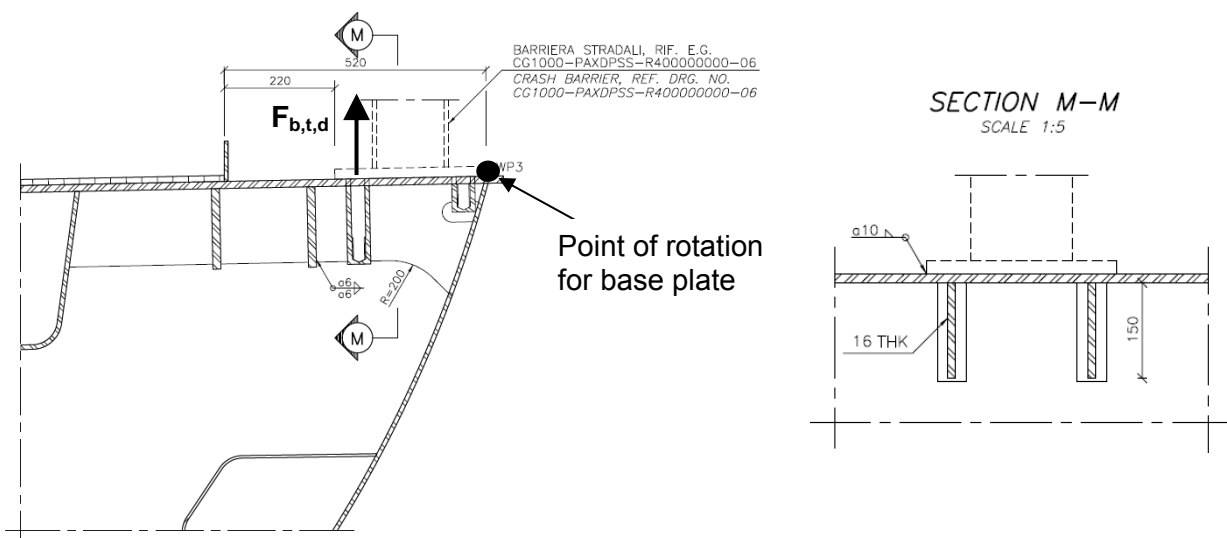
Applied load and geometry of back-up steel for crash barriers
